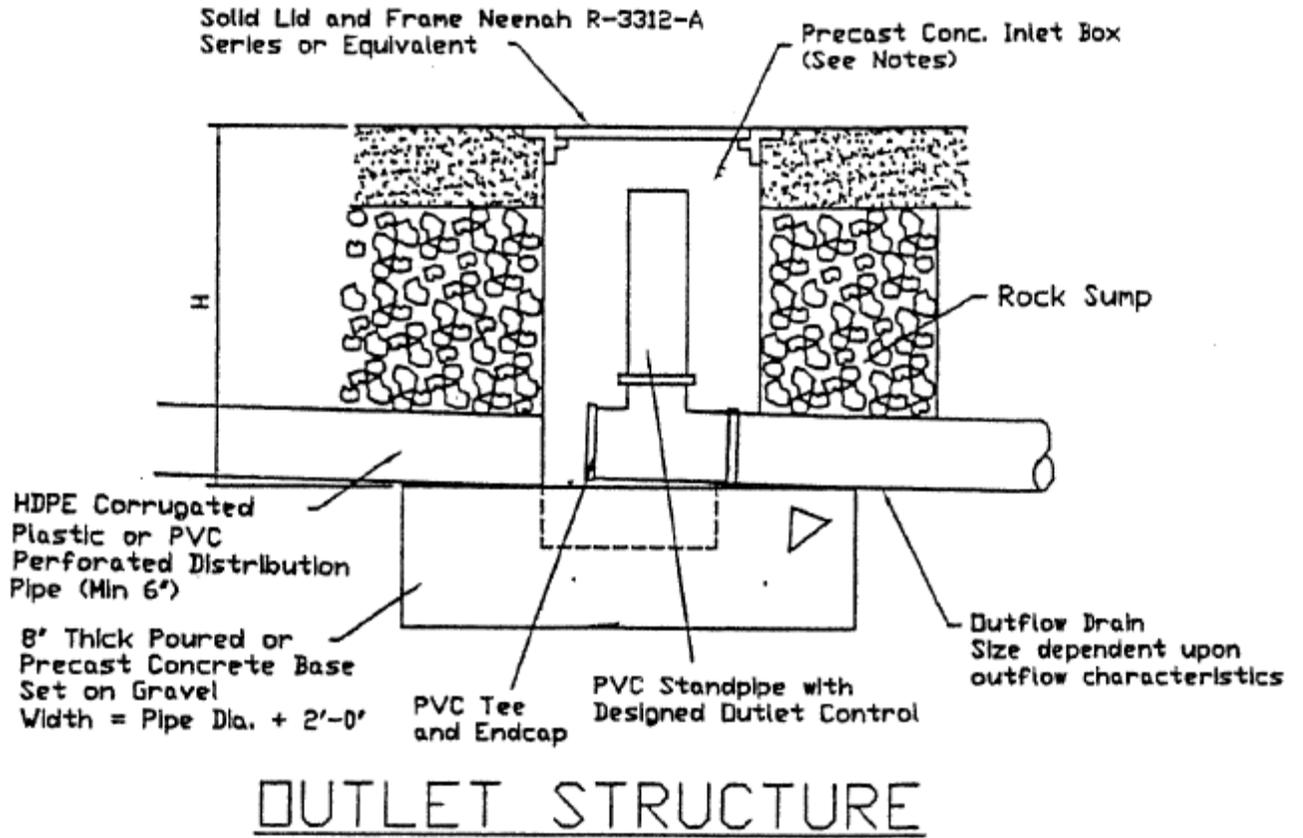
Rock Sump Detail (< 400 SF of impervious area)
